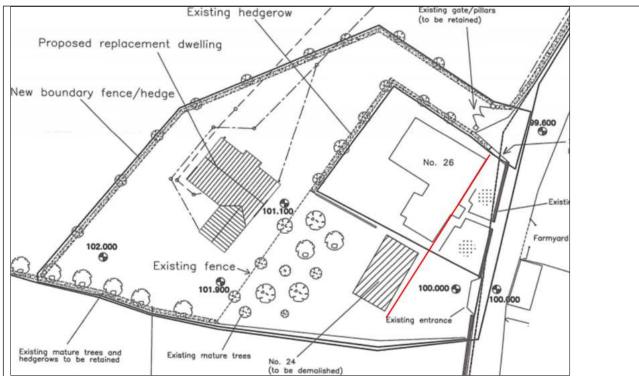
Block plan showing no. 26 applicant's home and no. 24 building to be replaced.
